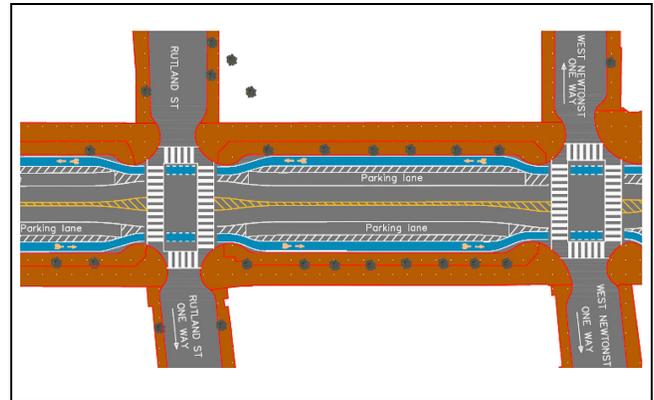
Road diet plan for Tremont Street, with bike lanes and parking restrictions at the corner bulbouts contributing to informal flares.
